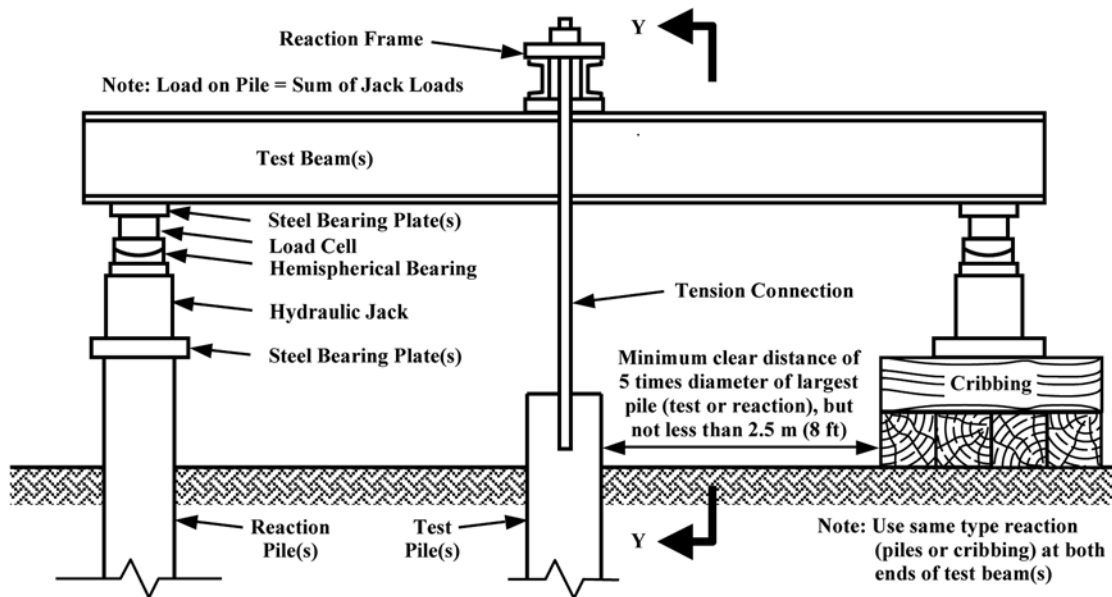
Typical Setup for Tensile Load Test Using Hydraulic Jacks Acting Upward on Both Ends of Test Beam(s)
